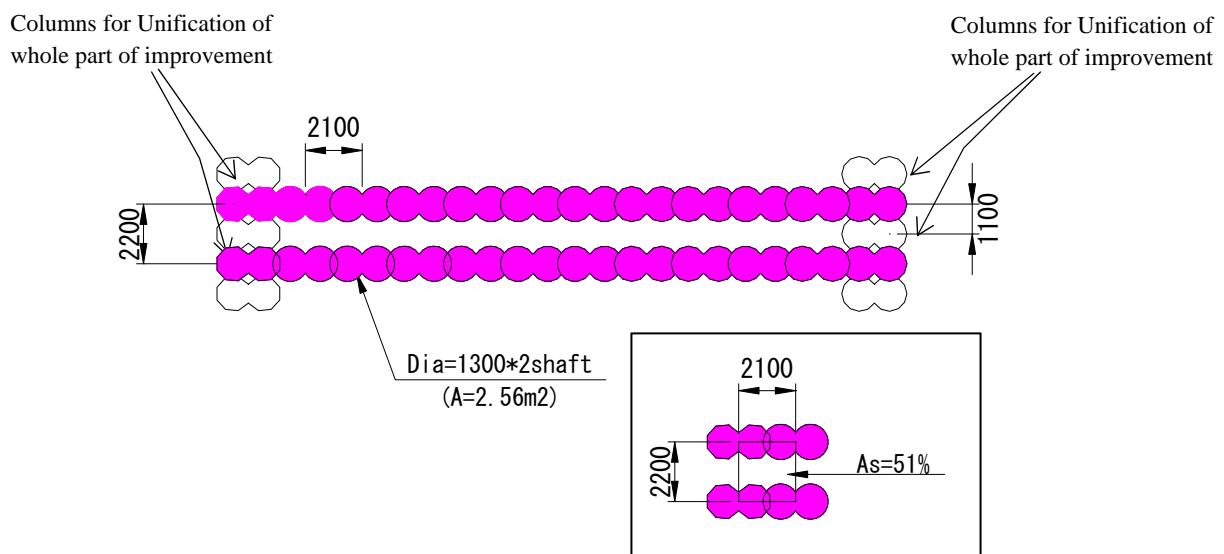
Typical Layout of Improved Columns for the Area behind Earth Retaining Wall
